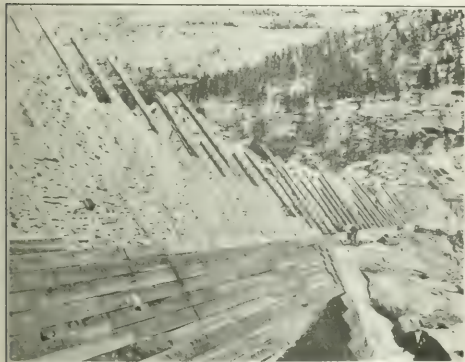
METHOD OF BREAKING JOINTS ON FACING TIMBERS
